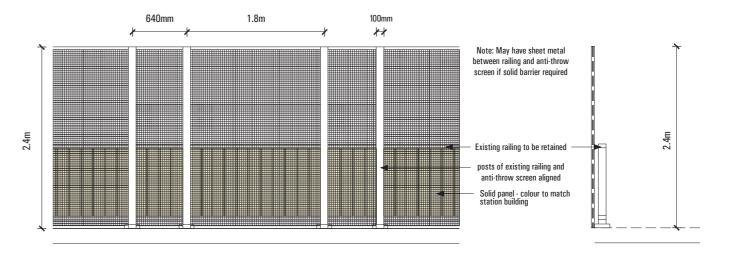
Indicative Elevation and Section: Revised concept design existing traffic barrier with new anti-throw screen attached to the outside edge (Cheltenham Road or Chapman Avenue)
